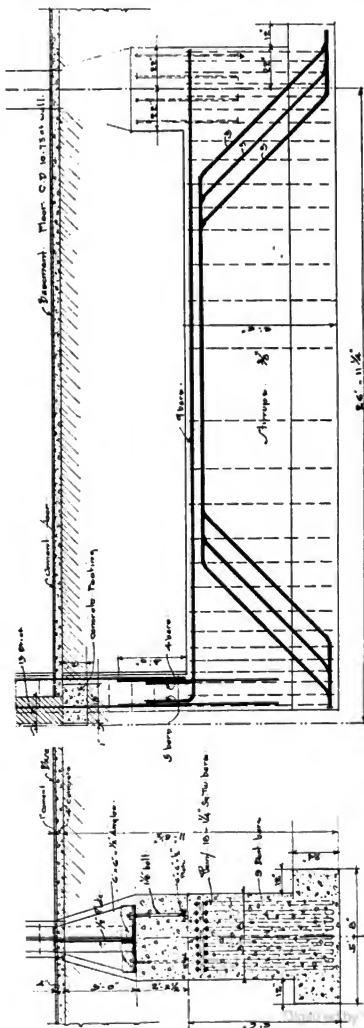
SECTION AND ELEVATION OF REINFORCED CONCRETE FOOTINGS. This is cantilevered so that wall columns are carried entirely within property line.
